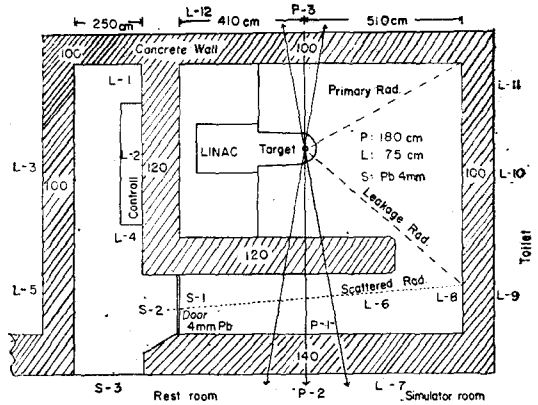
Plan view of treatment room showing protective barriers and interesting points.
